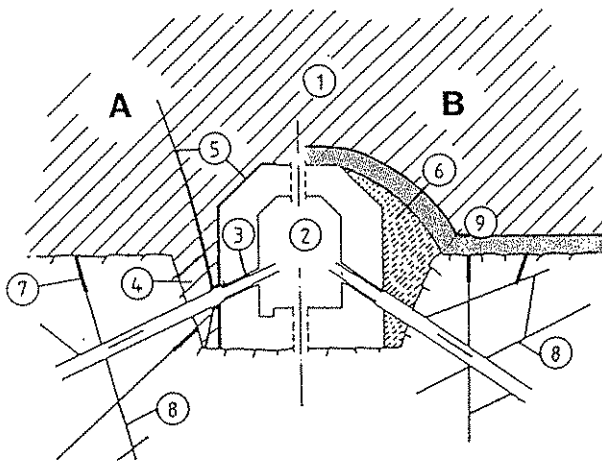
Rockfill dam with earth core. Junction of the core and a gallery structure.
